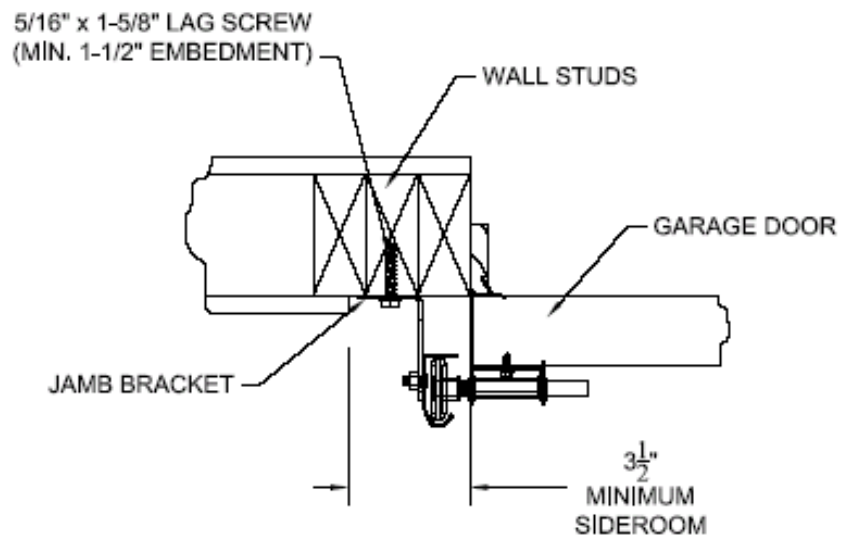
Attachment of garage door brackets directly to wood wall framing (Option 1)
